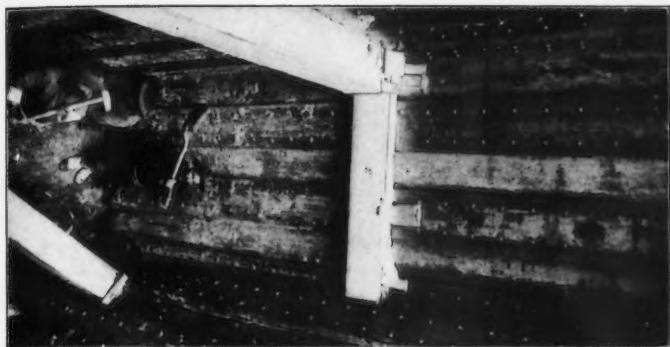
Old-style Heavy Steel Sheet-Piling for Foundation Pits.
